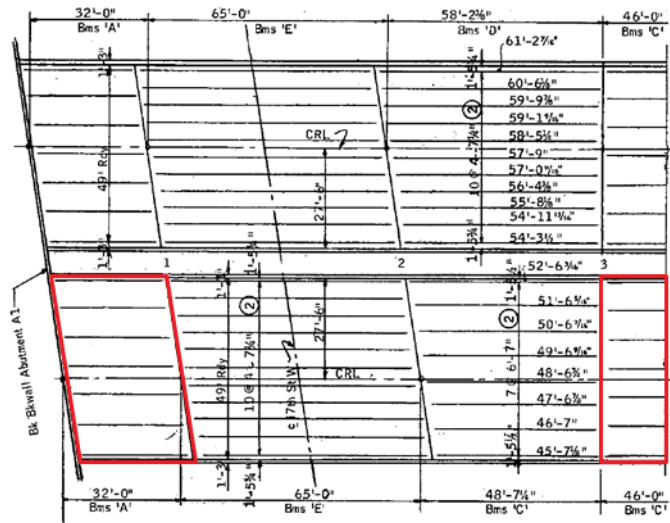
Locations of girders A and C in original plans of the I-244 bridge
